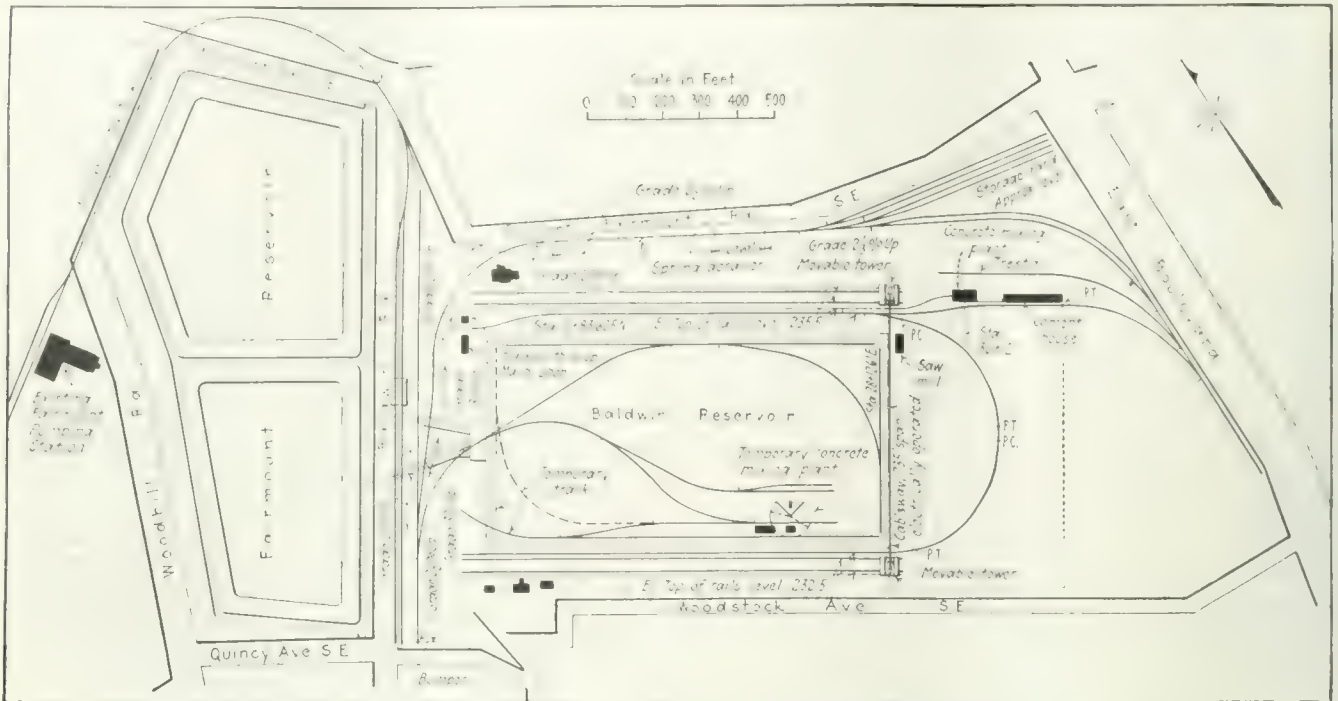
TRACK AND PLANT LAYOUT FOR BALDWIN RESERVOIR
